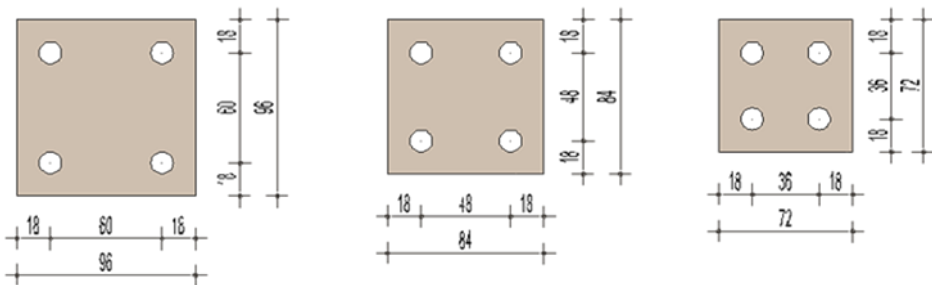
Pile arrangement and capping beam dimensions (in mm)
